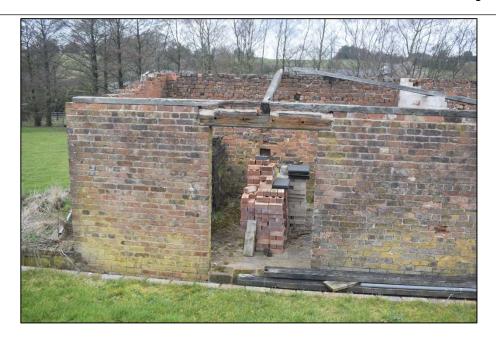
View west of the southern end of the building showing the remnant roof structure Photo CPAT 5040\_010
